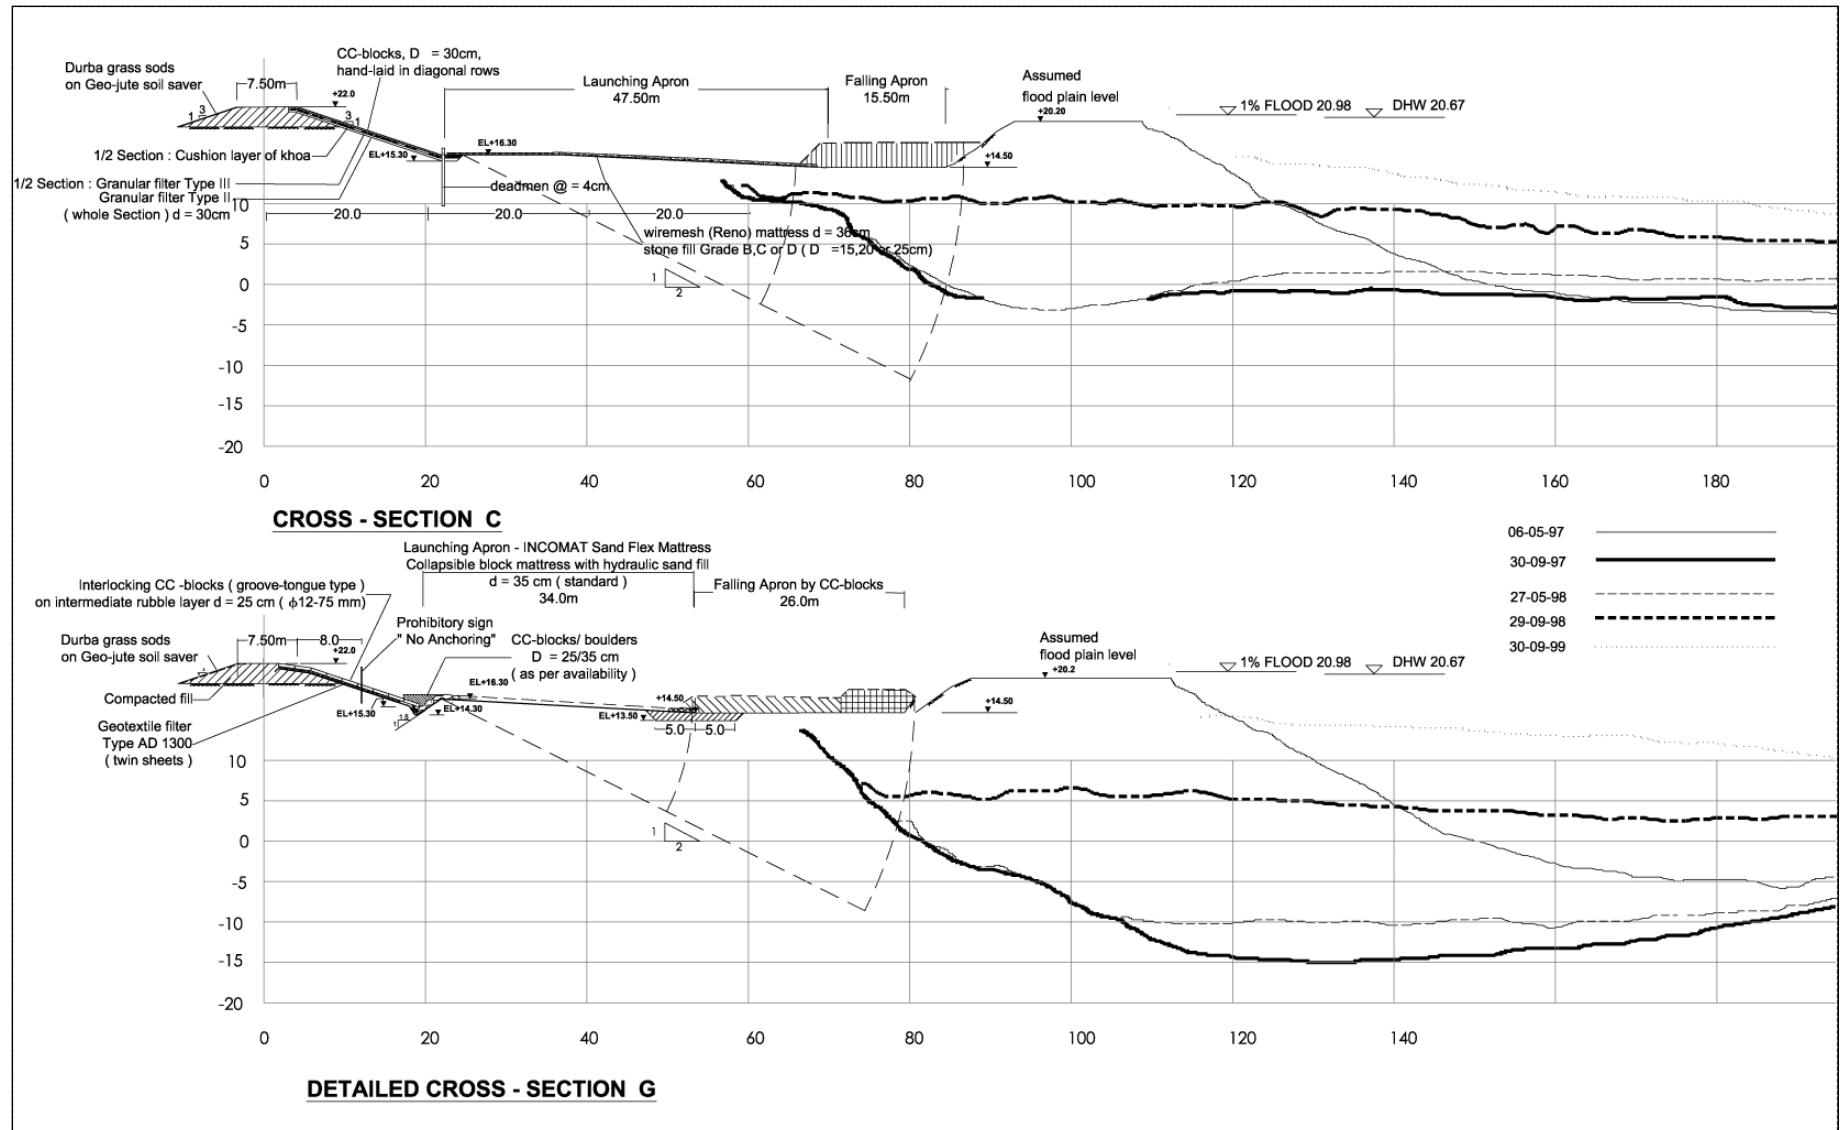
Typical cross-section of Bahadurabad revetment.
